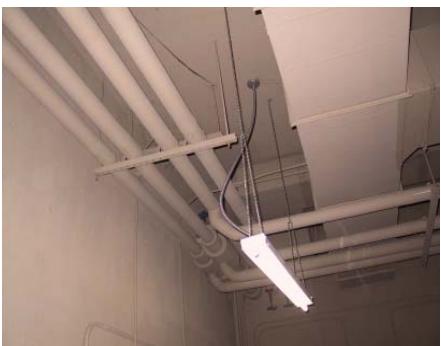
Example of no seismic bracing on the piping or the duct work.
